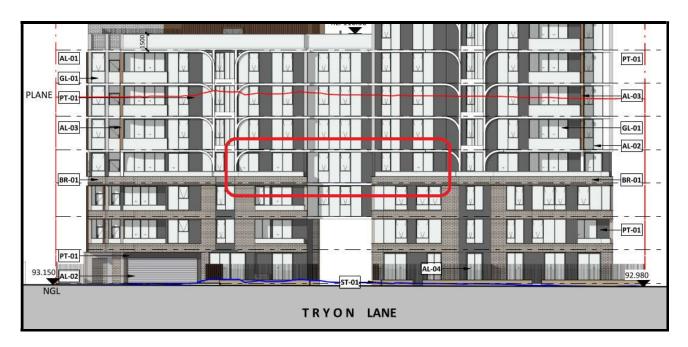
inadequate privacy measures between adjoining balconies of Buildings C and D (elevation view)
